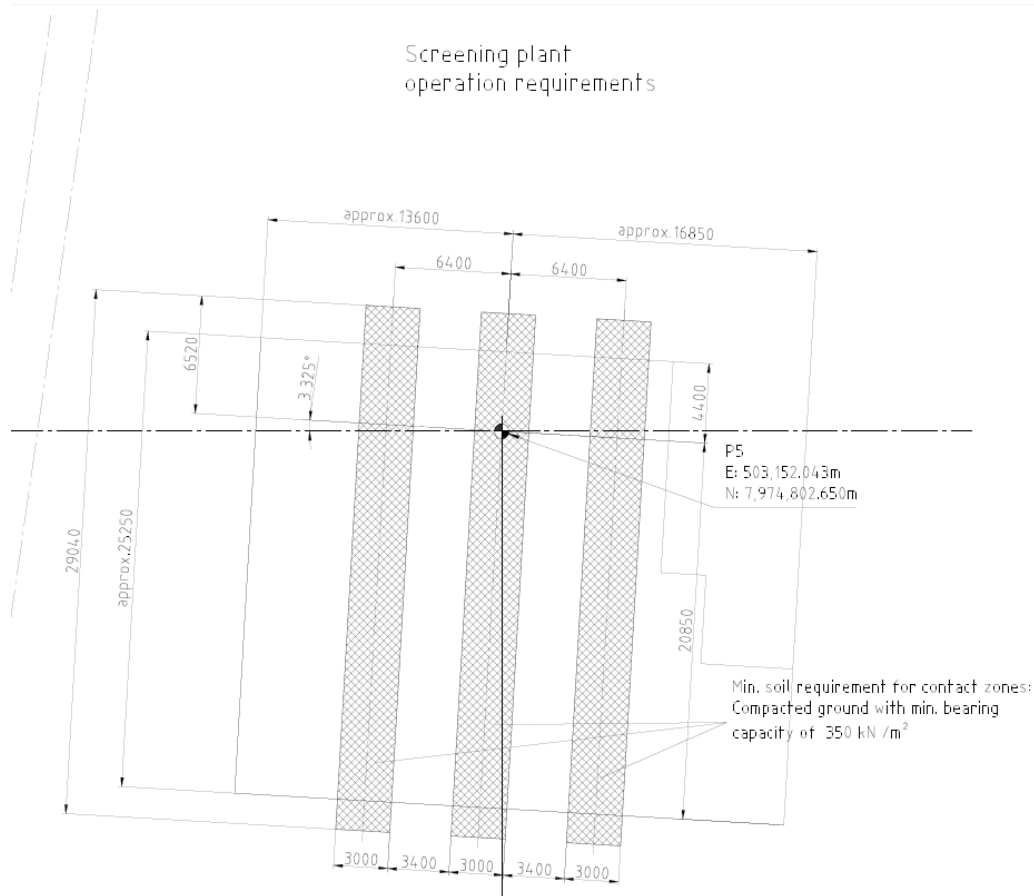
and Figure 5-4 shows the general layout of the crushing plant footings, as per Drawing No. 4853005 by tkIS. The following summarizes Hatch's understanding of the foundations:
